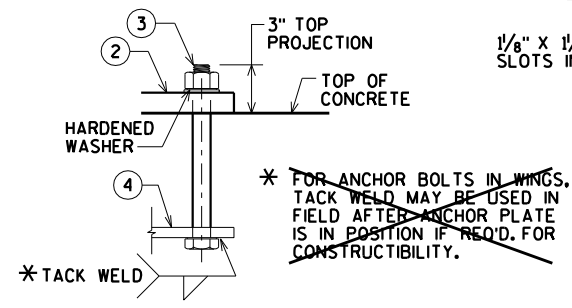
DETAIL AT END POST (THRIE BEAM RAIL ATTACHMENT)
